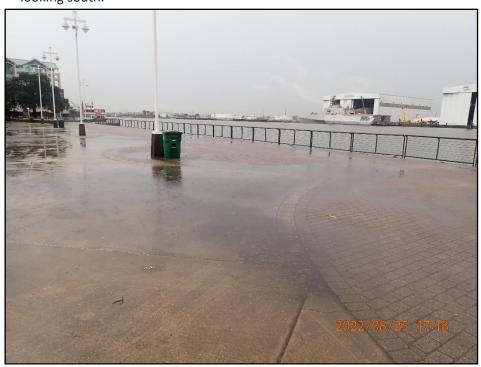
Areas of settlement behind timber bulkhead. Southern end of relieving platform, looking northeast.
